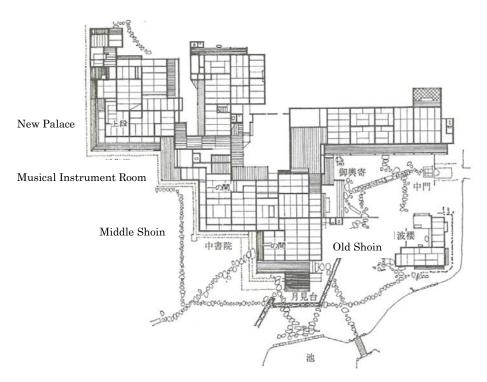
Plan of main buildings of Katsura Imperial Villa (constructed through a few decades after 1615)
